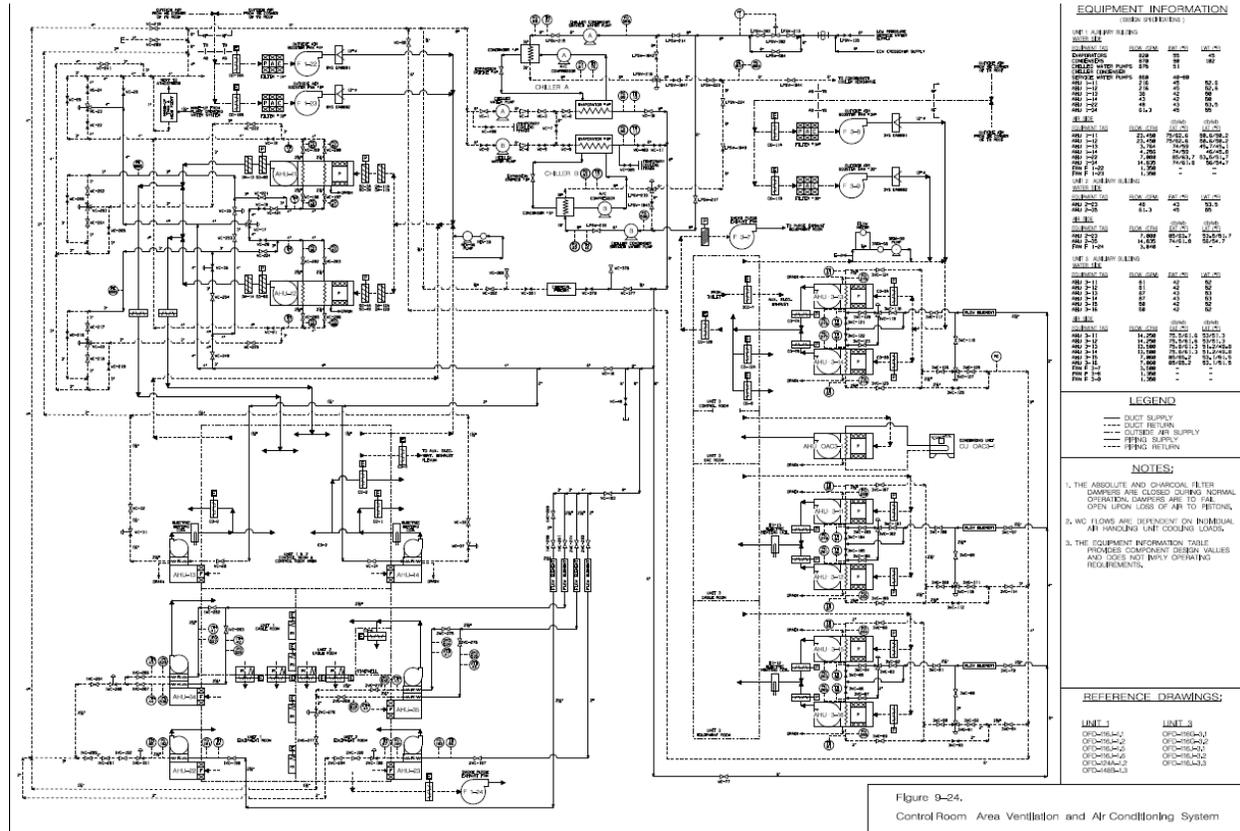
Control Room Area Ventilation and Air Conditioning System
